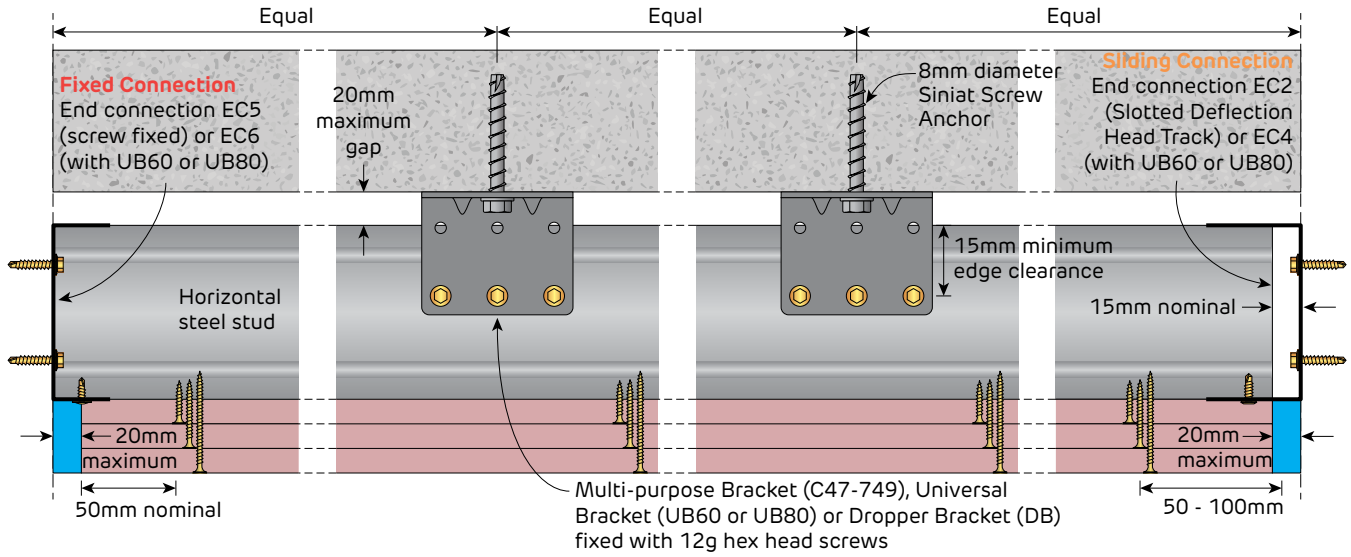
Stud Ceiling Type A4 - Fixed / Sliding
